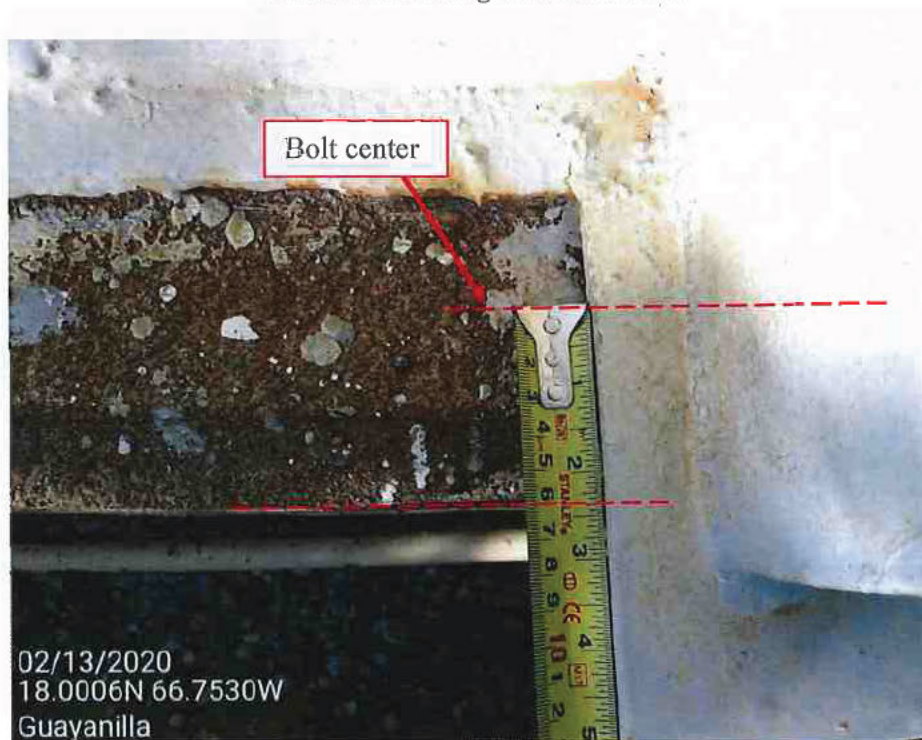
Anchor bolt ripped off from concrete base, due to seismic overturning moment.
